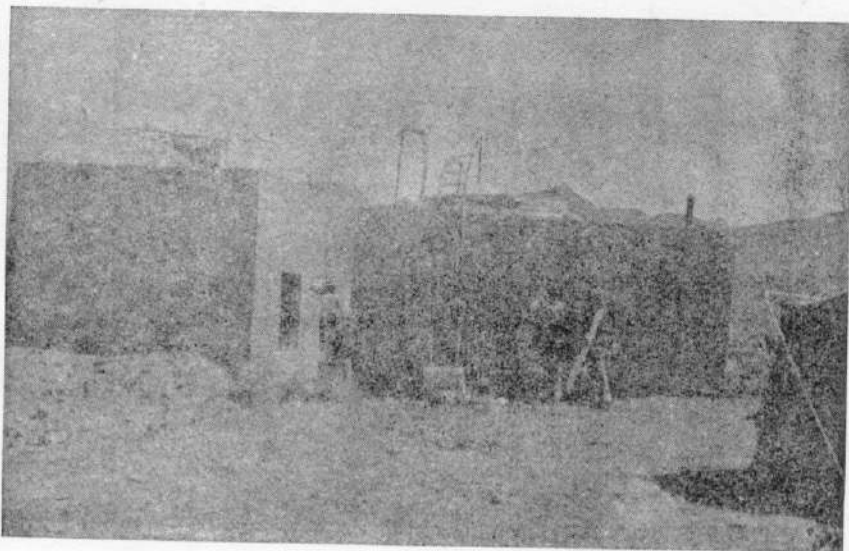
Collapse of a reinforced concrete water tank near village Dohran, the adjoining pump house suffered cracks in the walls.
